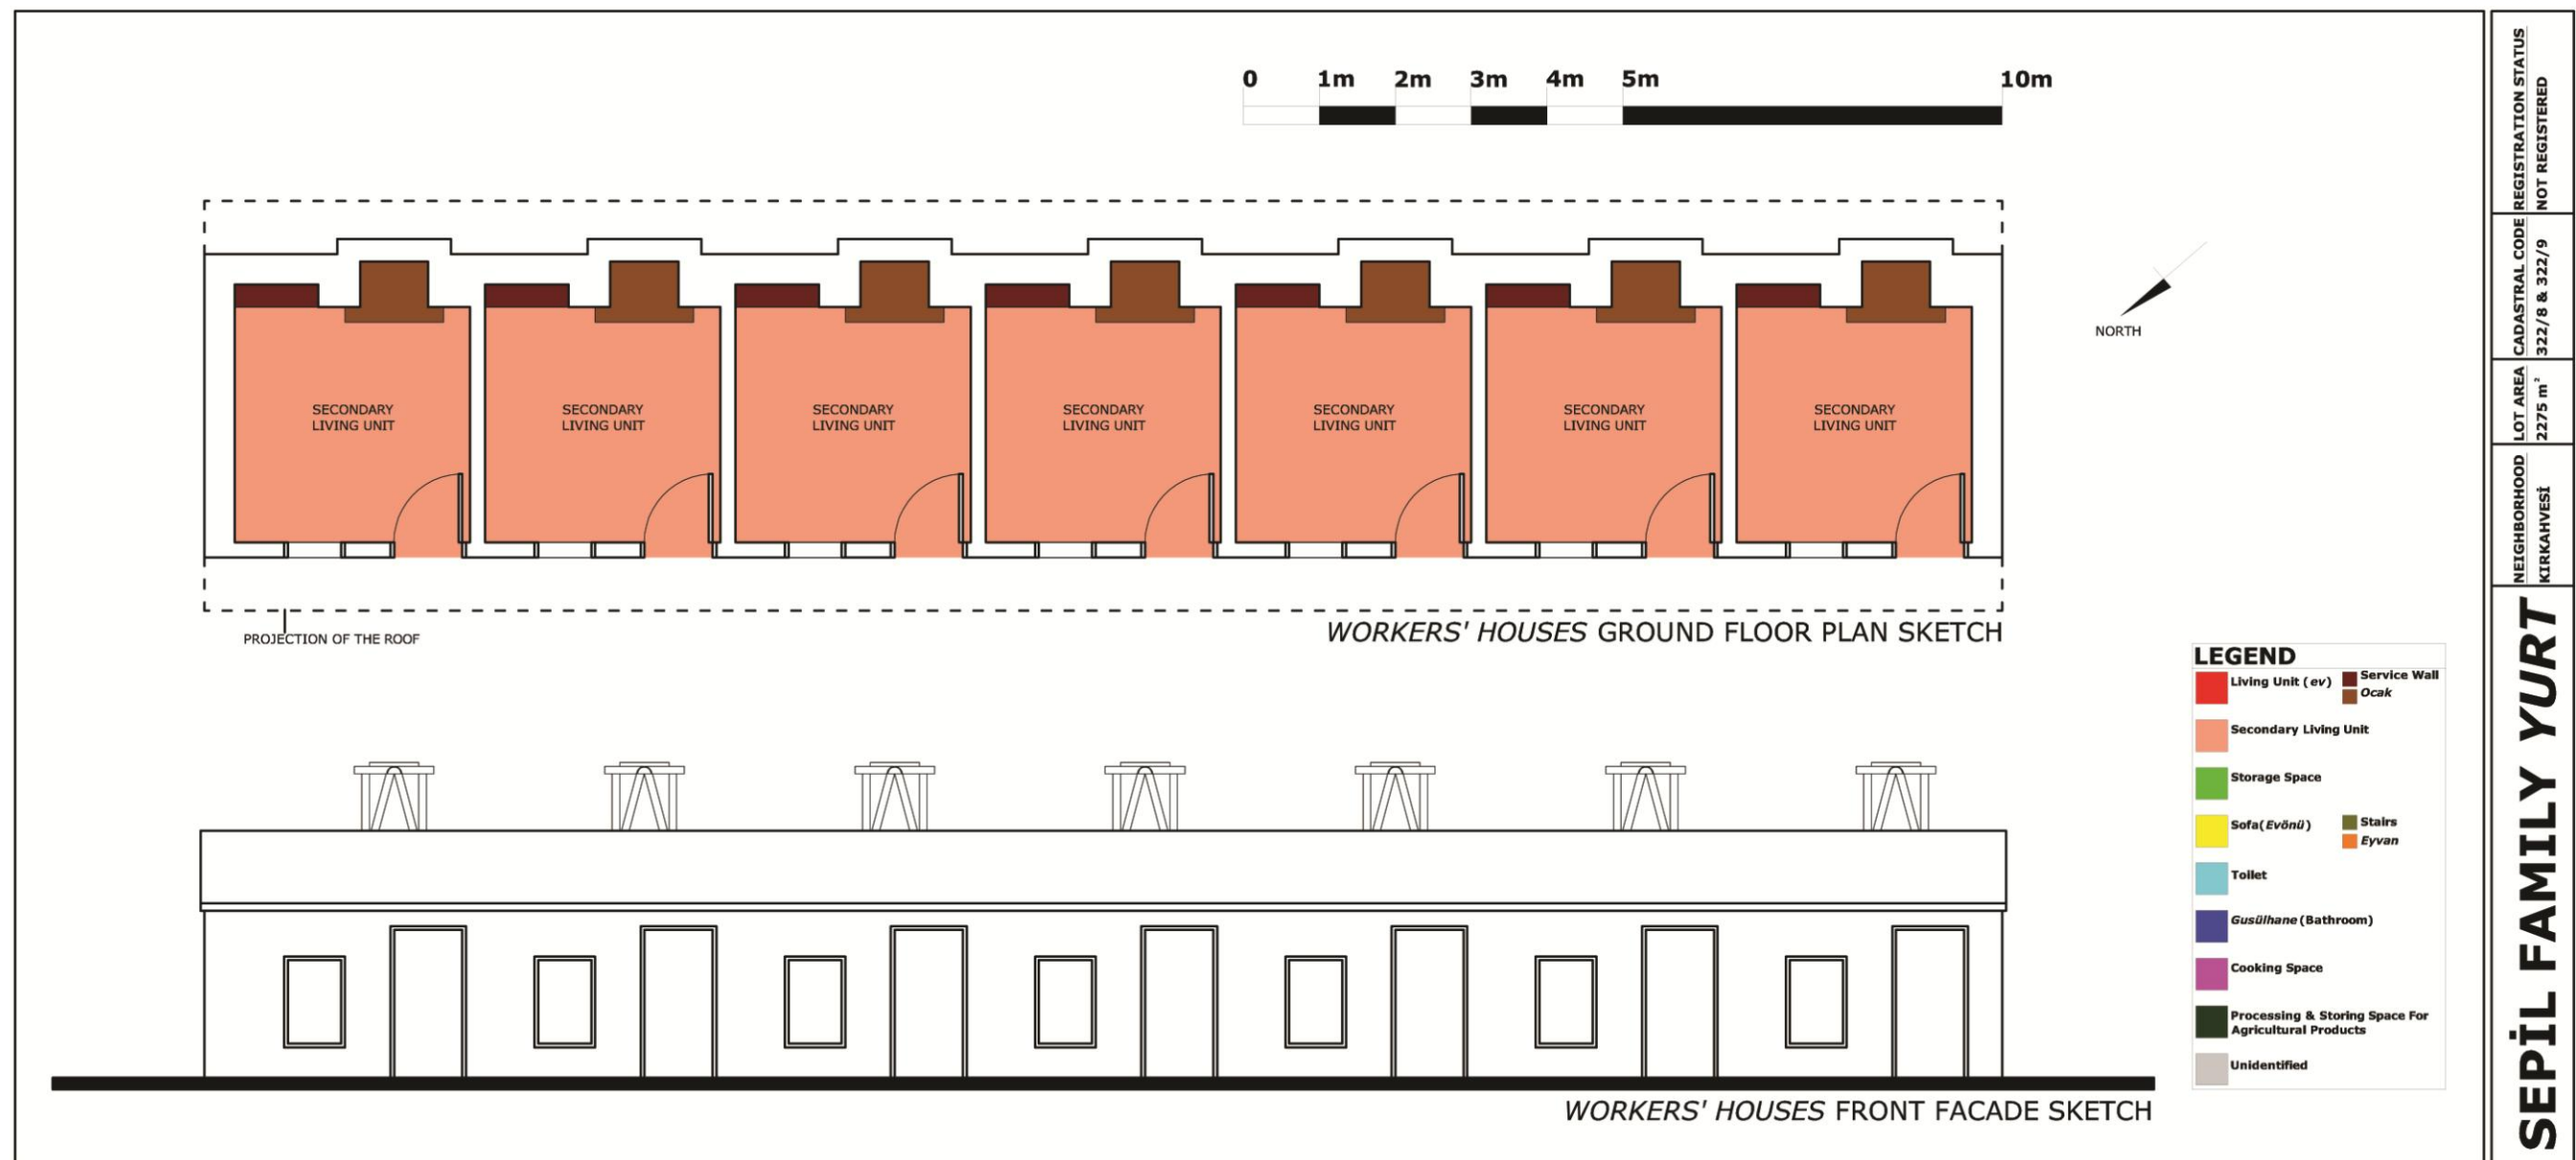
Plan and front façade sketches of the *worker house in the yurt* of Sepil Family
